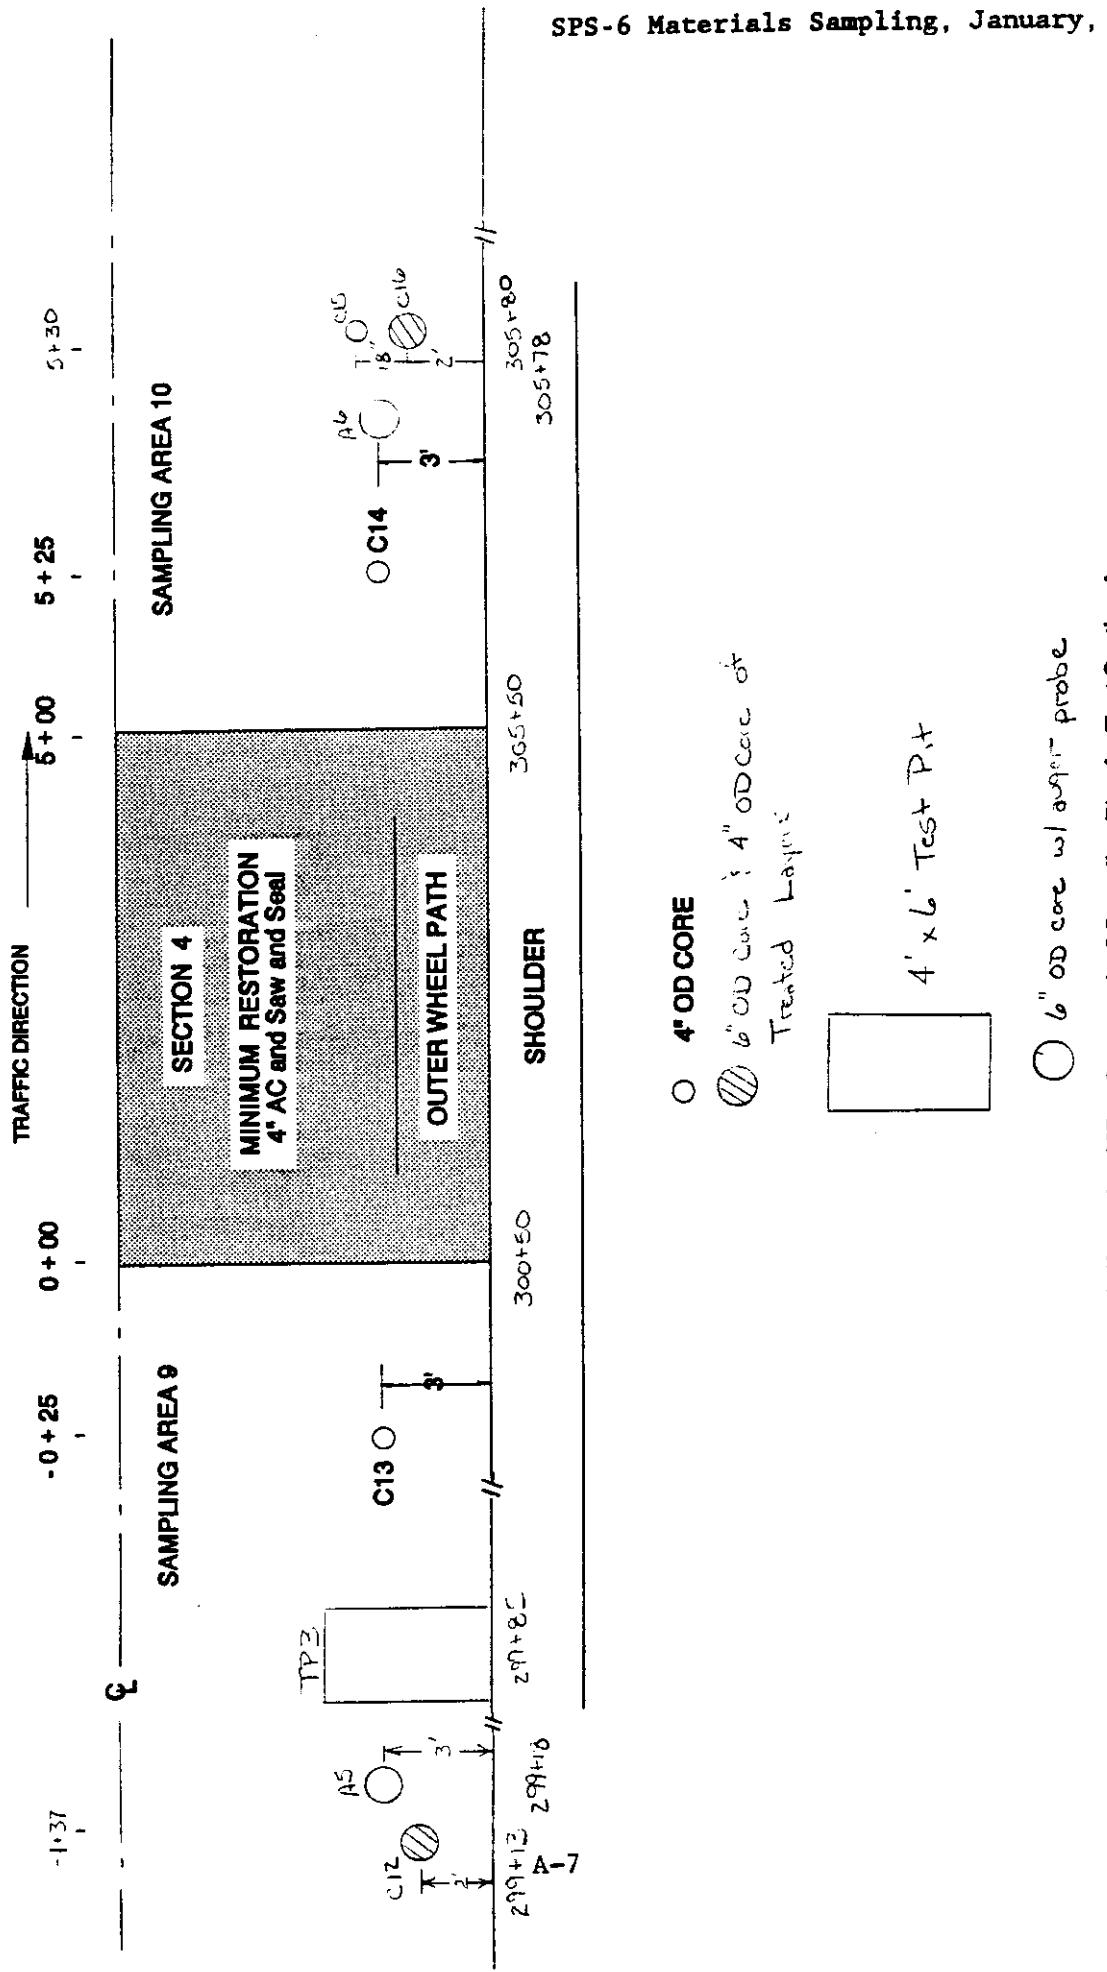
Example of "Pre-Construction" Sampling Plan for Test Section 4
